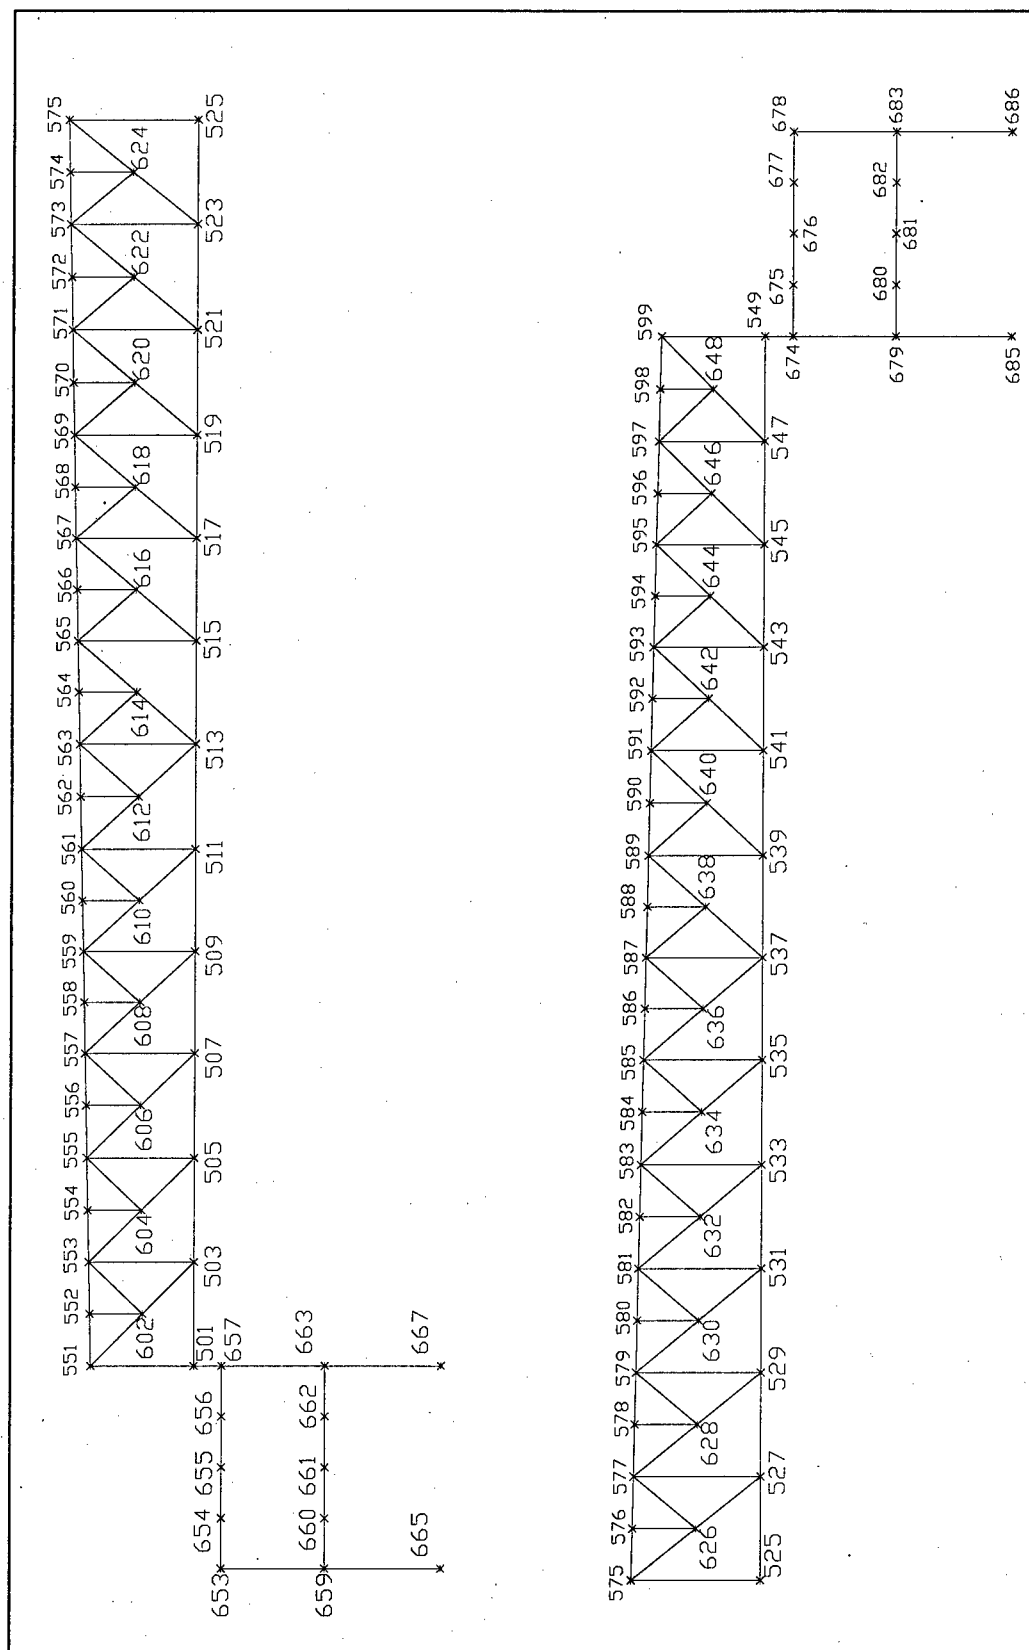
CCAD, TX, joint numbers for Truss T1, Hangars 43 and 47.
